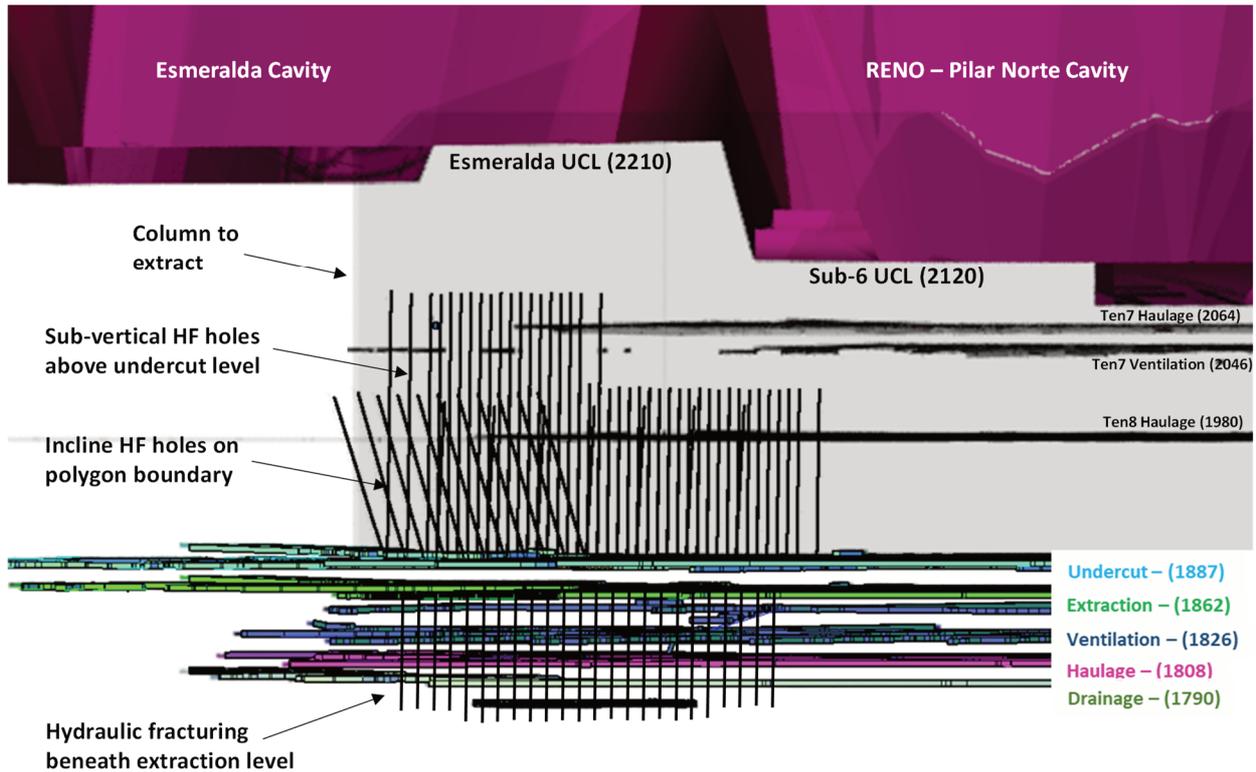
Andes Norte Project schematic view with levels elevations and configuration around current mining sectors, in addition to the HF design performed prior caving initiation
